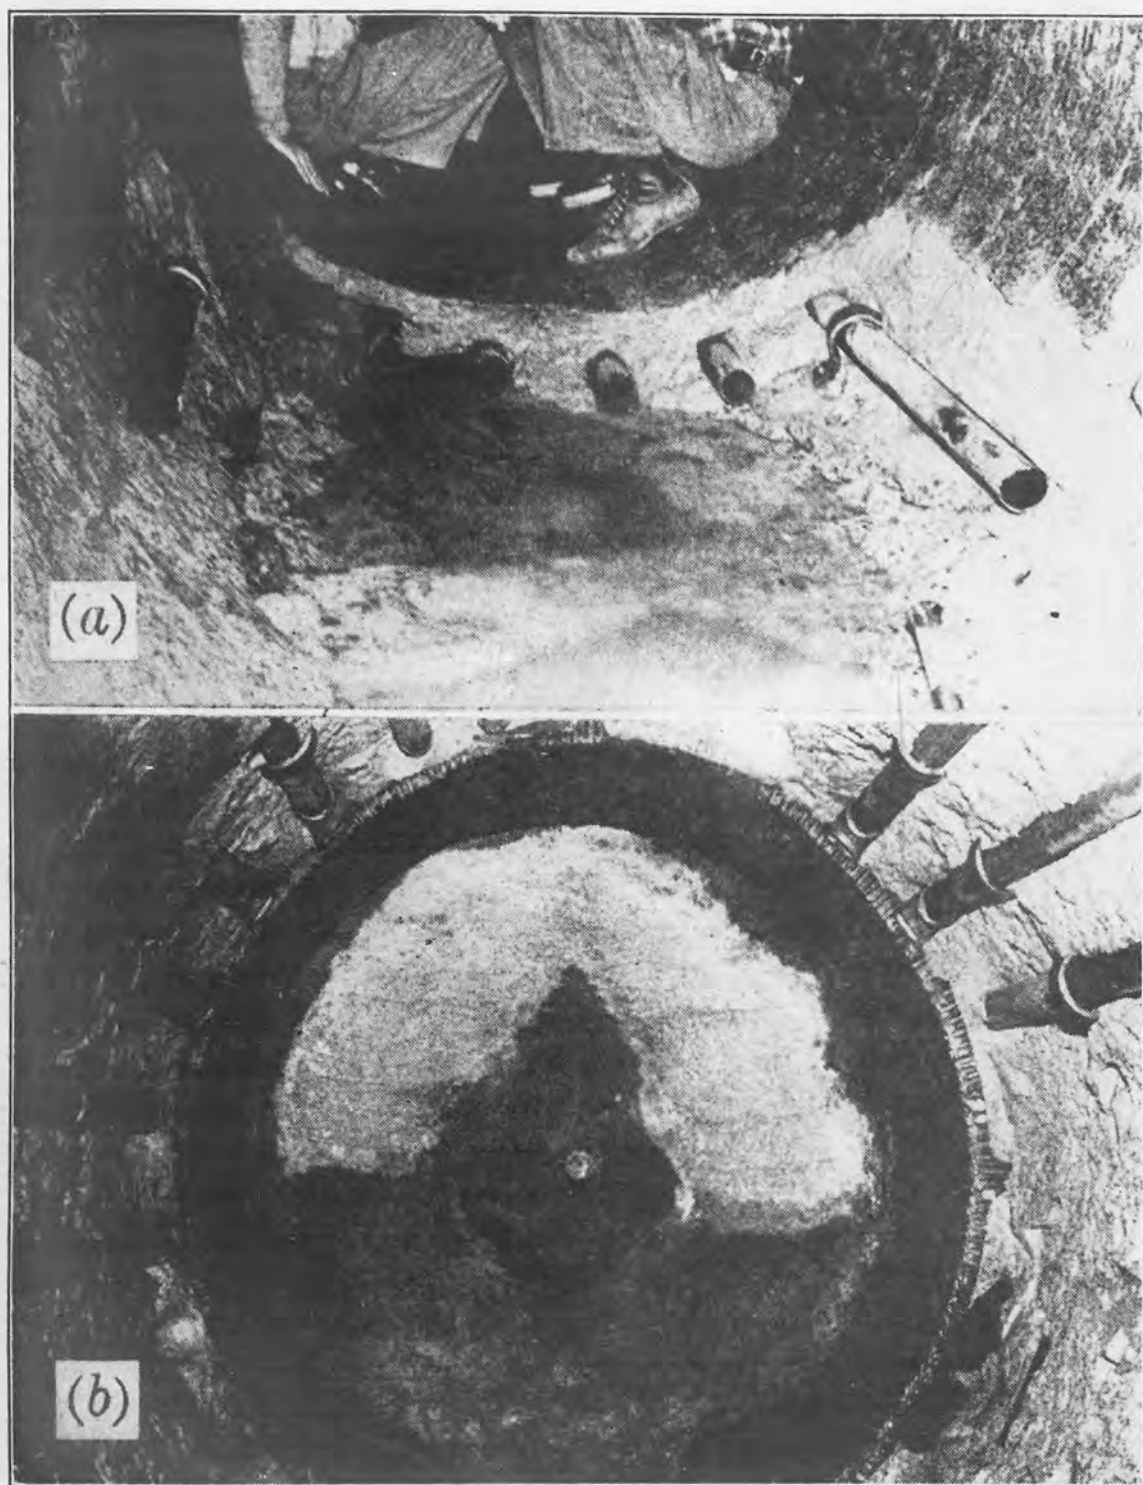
REMAINS OF 2-IN. AIR PIPES, SHOSHONE DAM: (a) Vent of a 52-In. Conduit Facing Downstream from the East Valve; (b) East Conduit
